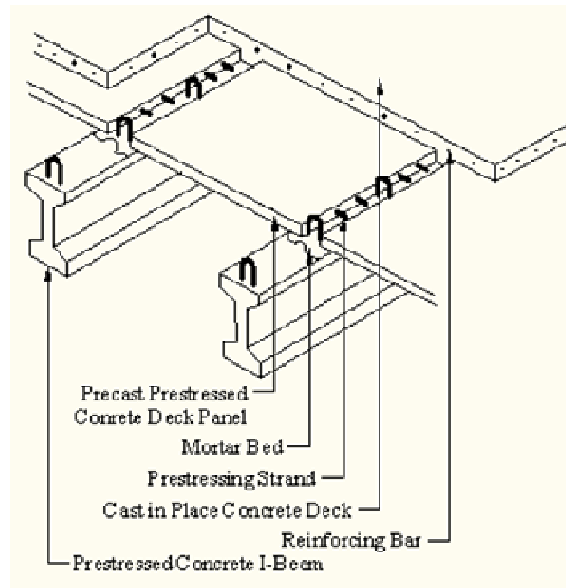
Typical partial-depth precast prestressed concrete deck panel (Sprinkel 1985)
